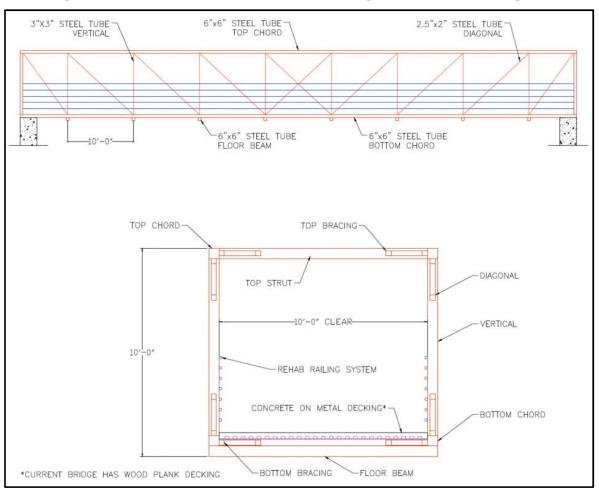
Cross Section and Profile of Existing South Channel Bridge
